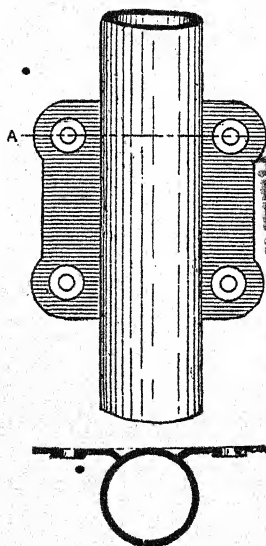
Elevation and Section of Cast Tack and Pipe.
